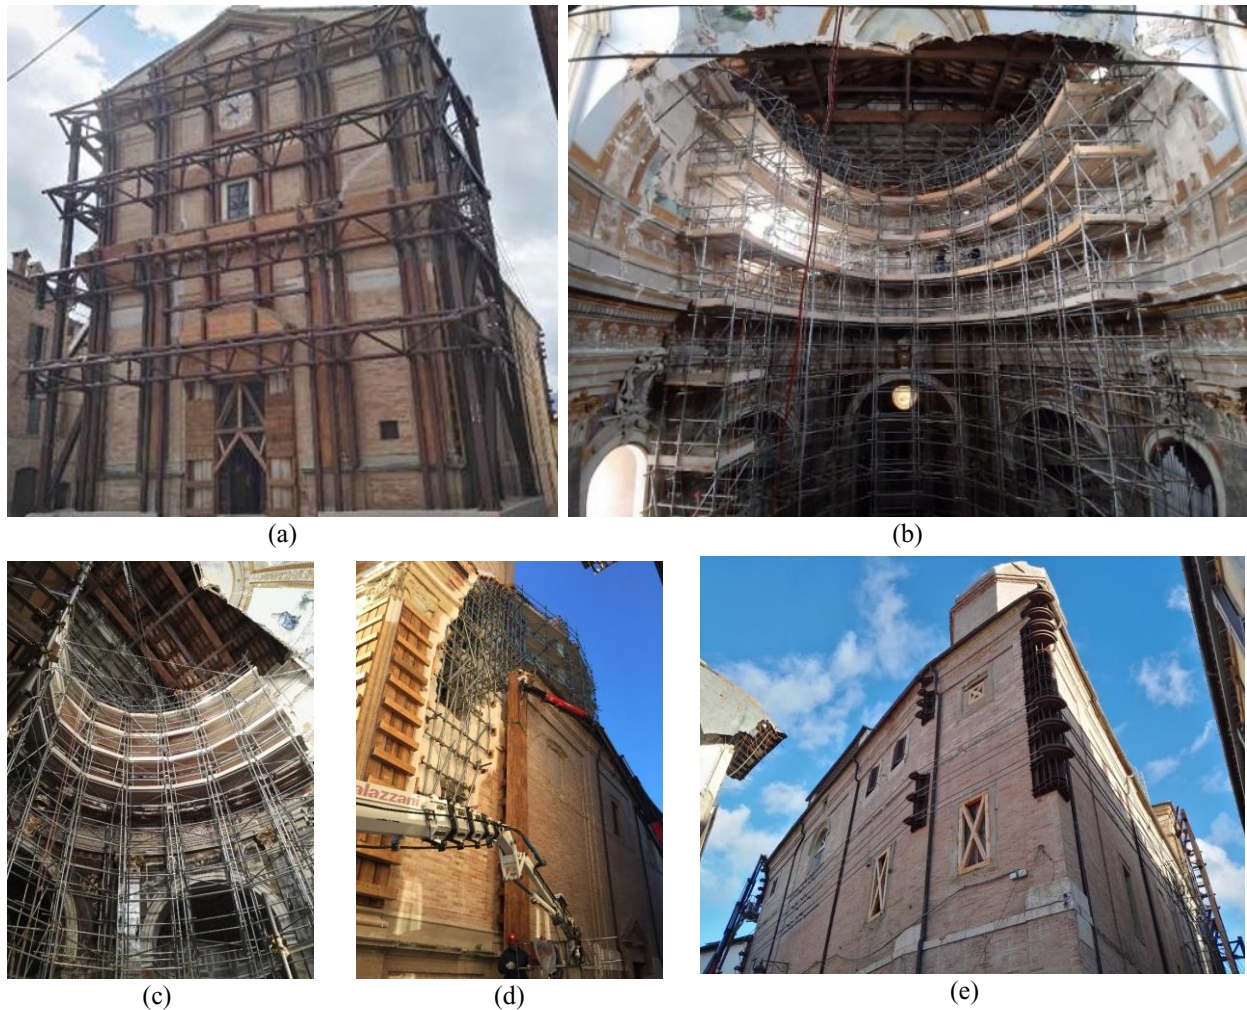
(a) External retaining steel structure; (b) and (c) latticed structure to prevent the out of plane collapse of the tiburium; (d) steel latticed systems to restore gravitational loading paths; (e) tensioning cables and guides.
